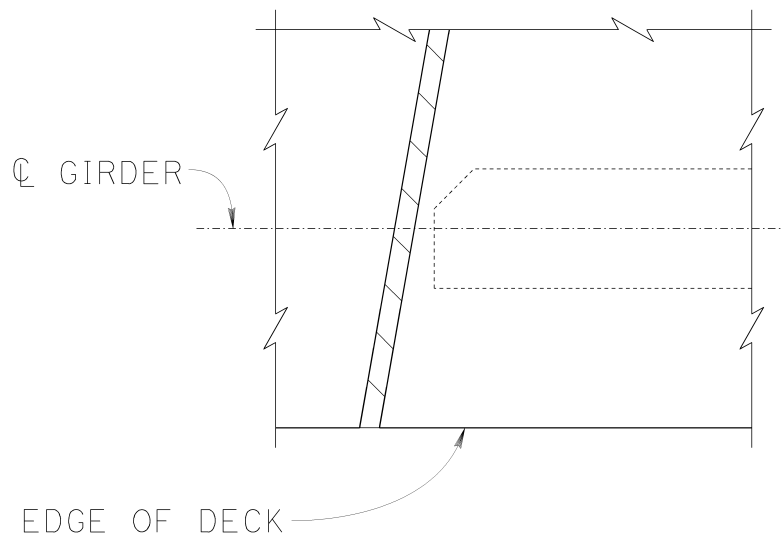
Deck Joints at Girders (Skew 0° to 20°)
